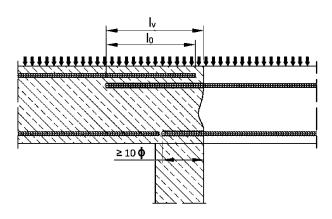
End anchoring of slabs or beams (e.g. designed as simply supported)
